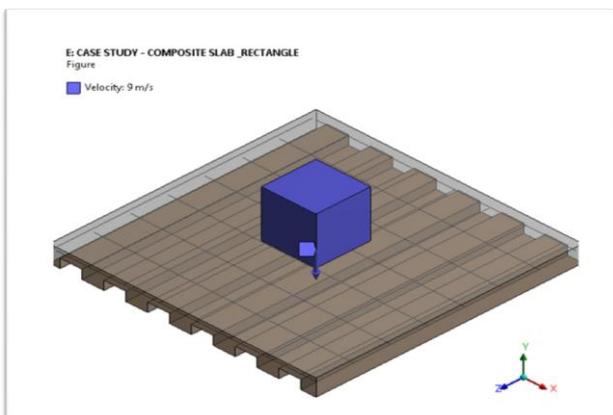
ANSYS modeling of composite slab with rectangular shaped steel deck sheet. (CSRE)
